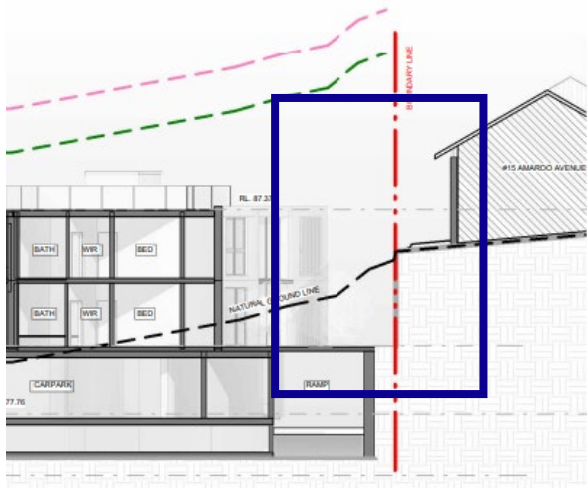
ILU 107 (shown in background) facing 15 Amaroo Avenue
